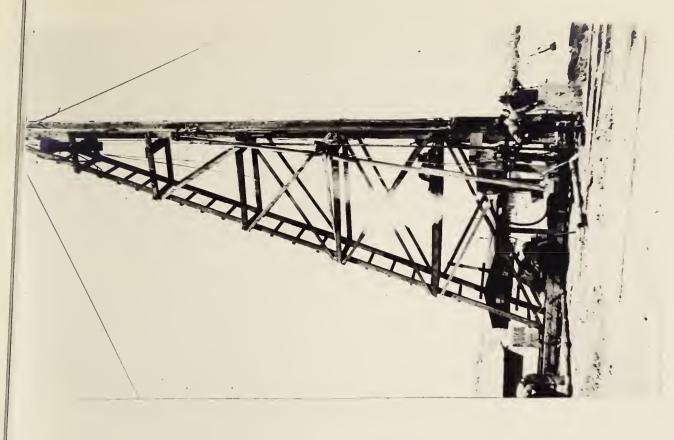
THE APPARATUS WAS MOUNTED ON THE END OF A 20-FOOT STEEL SHAFT ATTACHED TO ONE LEG OF THE PILE DRIVER.
